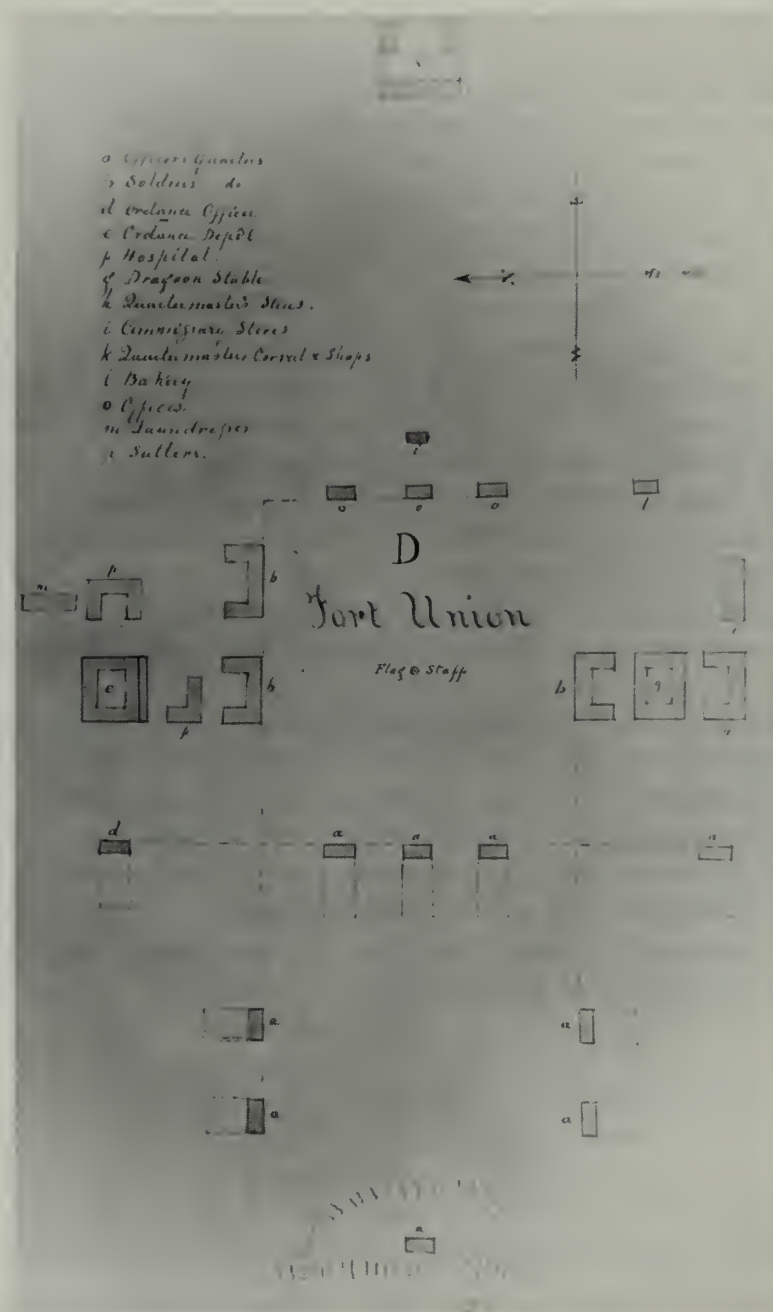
This plan of the first Fort Union accompanied the 1853 Mansfield inspection report. The plan shows the principal structures and the layout of the fort at that time around a central rectangular parade ground. Missing are the small ancillary structures adjacent to the main buildings. Outhouses, chicken coops, small storage buildings, and small personal barns do not appear on this plan although they did exist. Also, this map should be considered a relatively schematic representation rather than a thorough plan.
